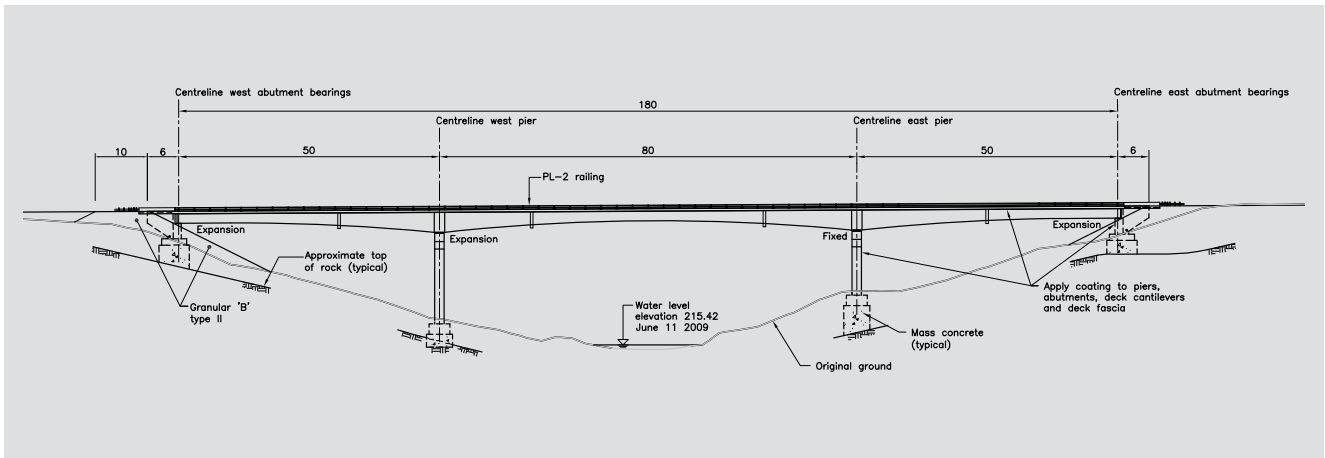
Elevation of eastbound bridge. Note: All measurements are in meters. 1 m = 3.28 ft. *Courtesy of MMM Group Ltd.
